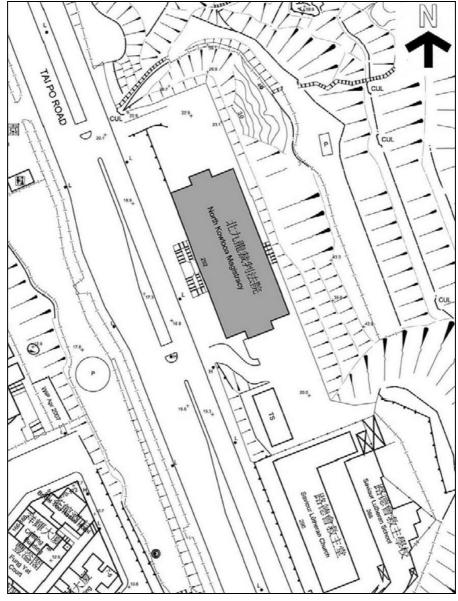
Site Location Plan (Source: NKM Resource Kit, DEVB)
